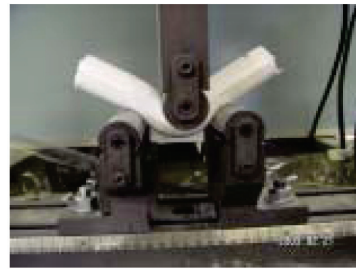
Typical aspect of bending fracture for foam cement filled jackets.
